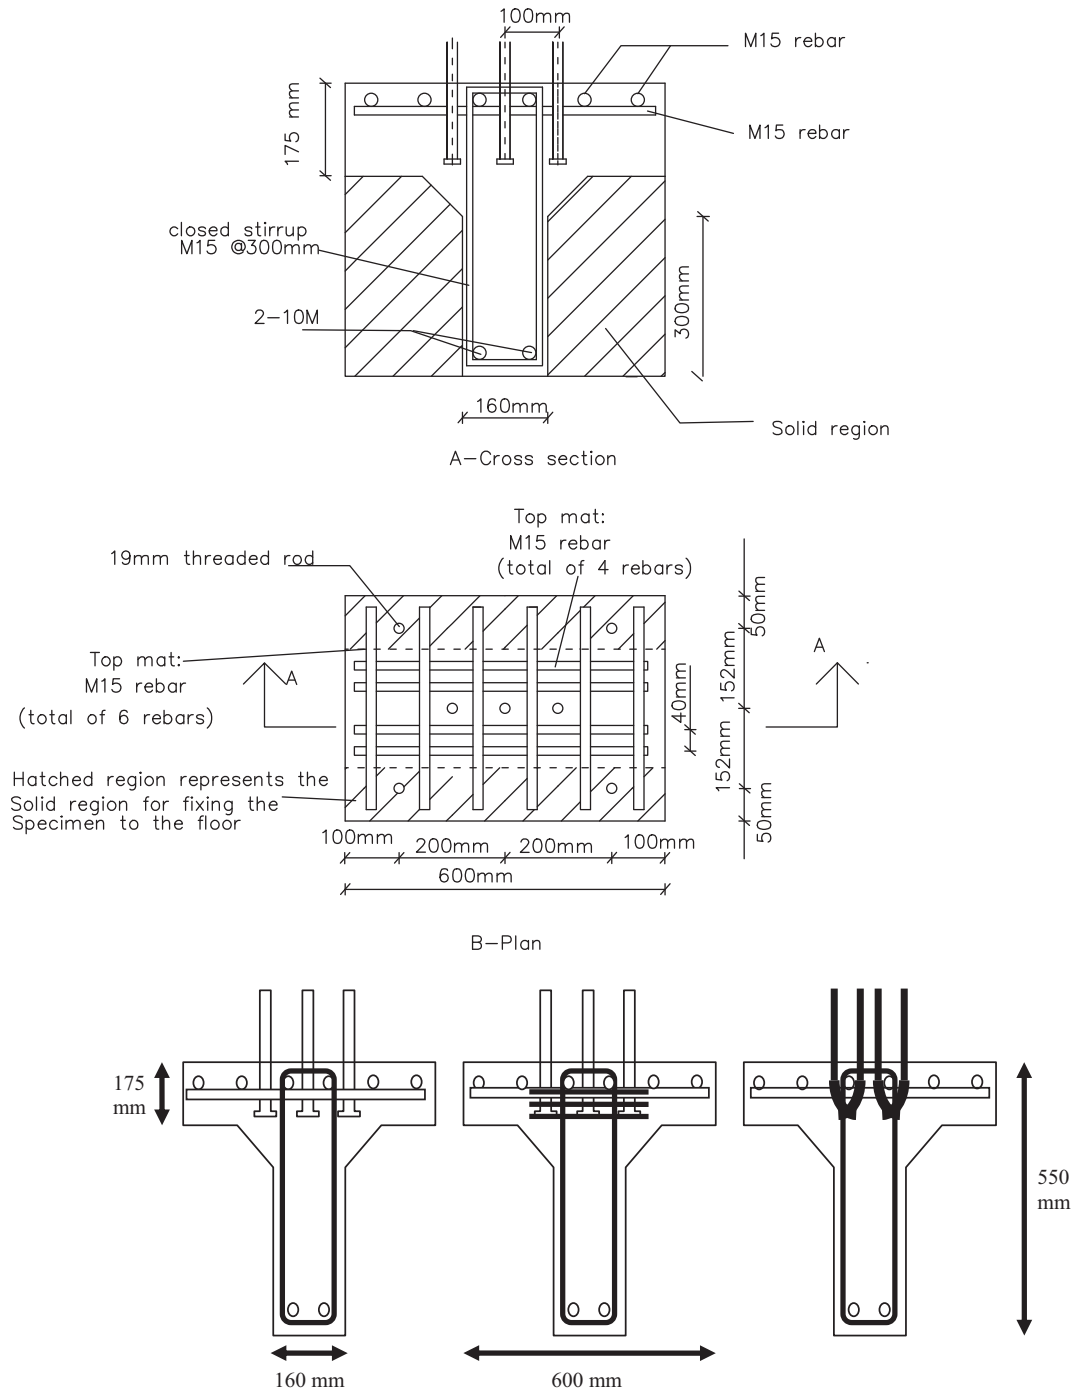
Schematic of reinforcement configurations for pullout specimens.
